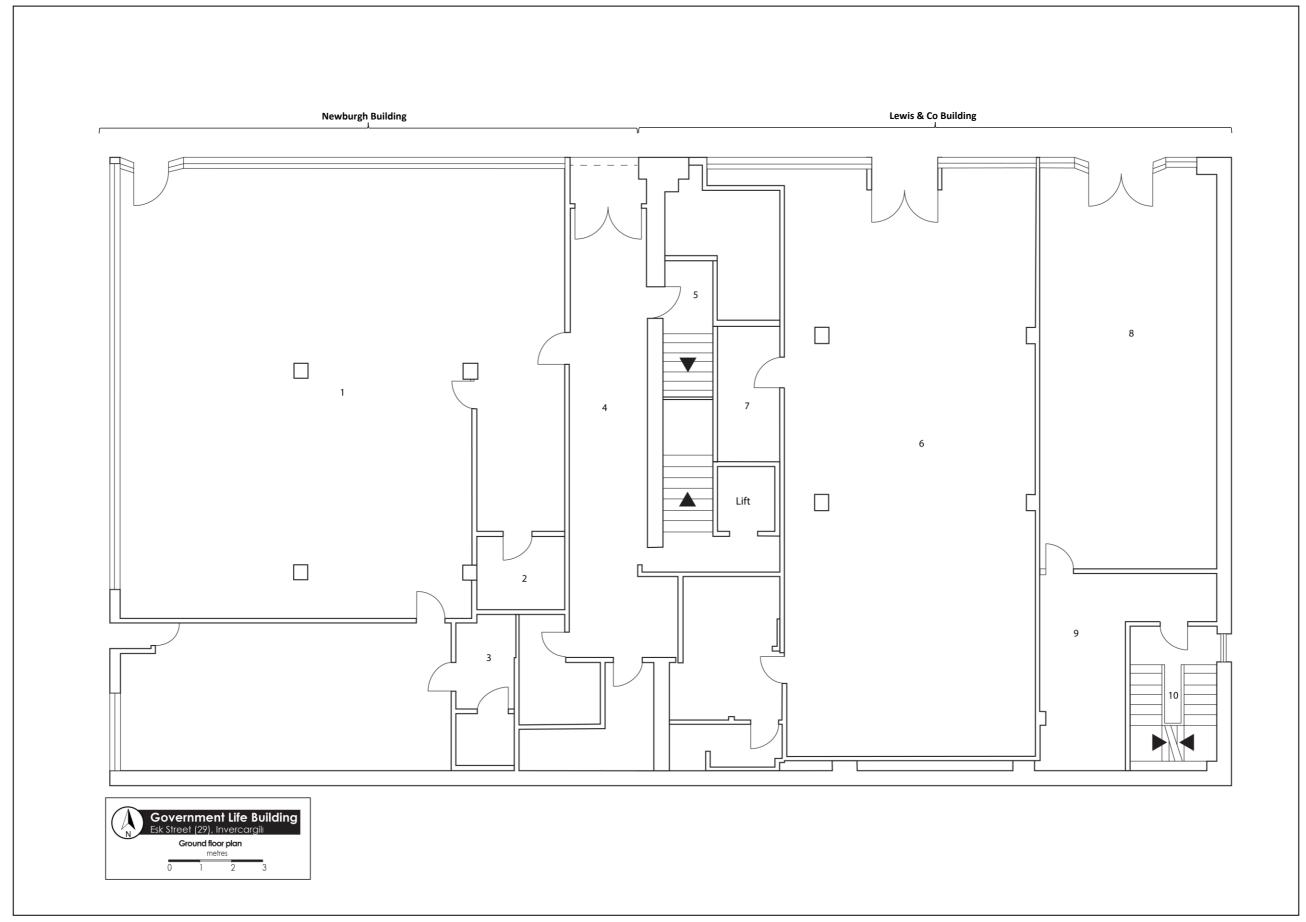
Ground floor plan of the Lewis & Co. (right) and Newburgh (left) Buildings, collectively referred to as the Government Life Building.
